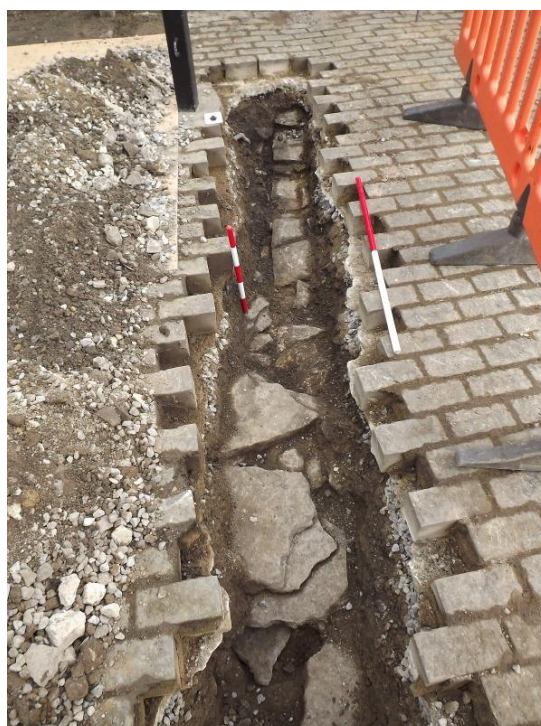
Stone culvert and curtain wall, looking north, scales 0.5 & 1m
